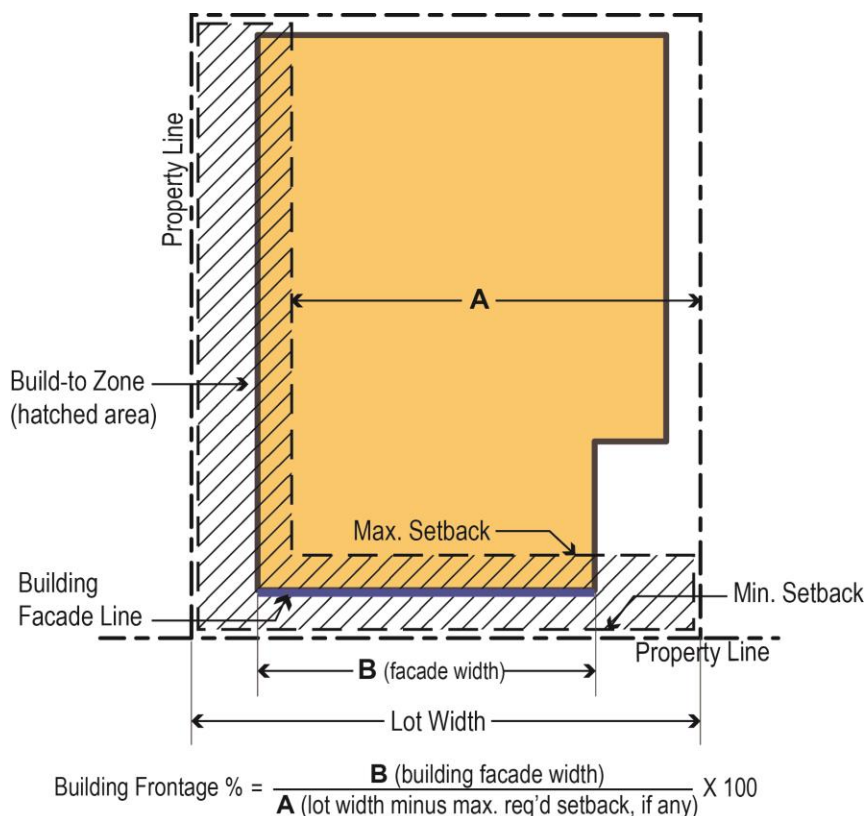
Percent of building façade required to be constructed within the build-to zone.
